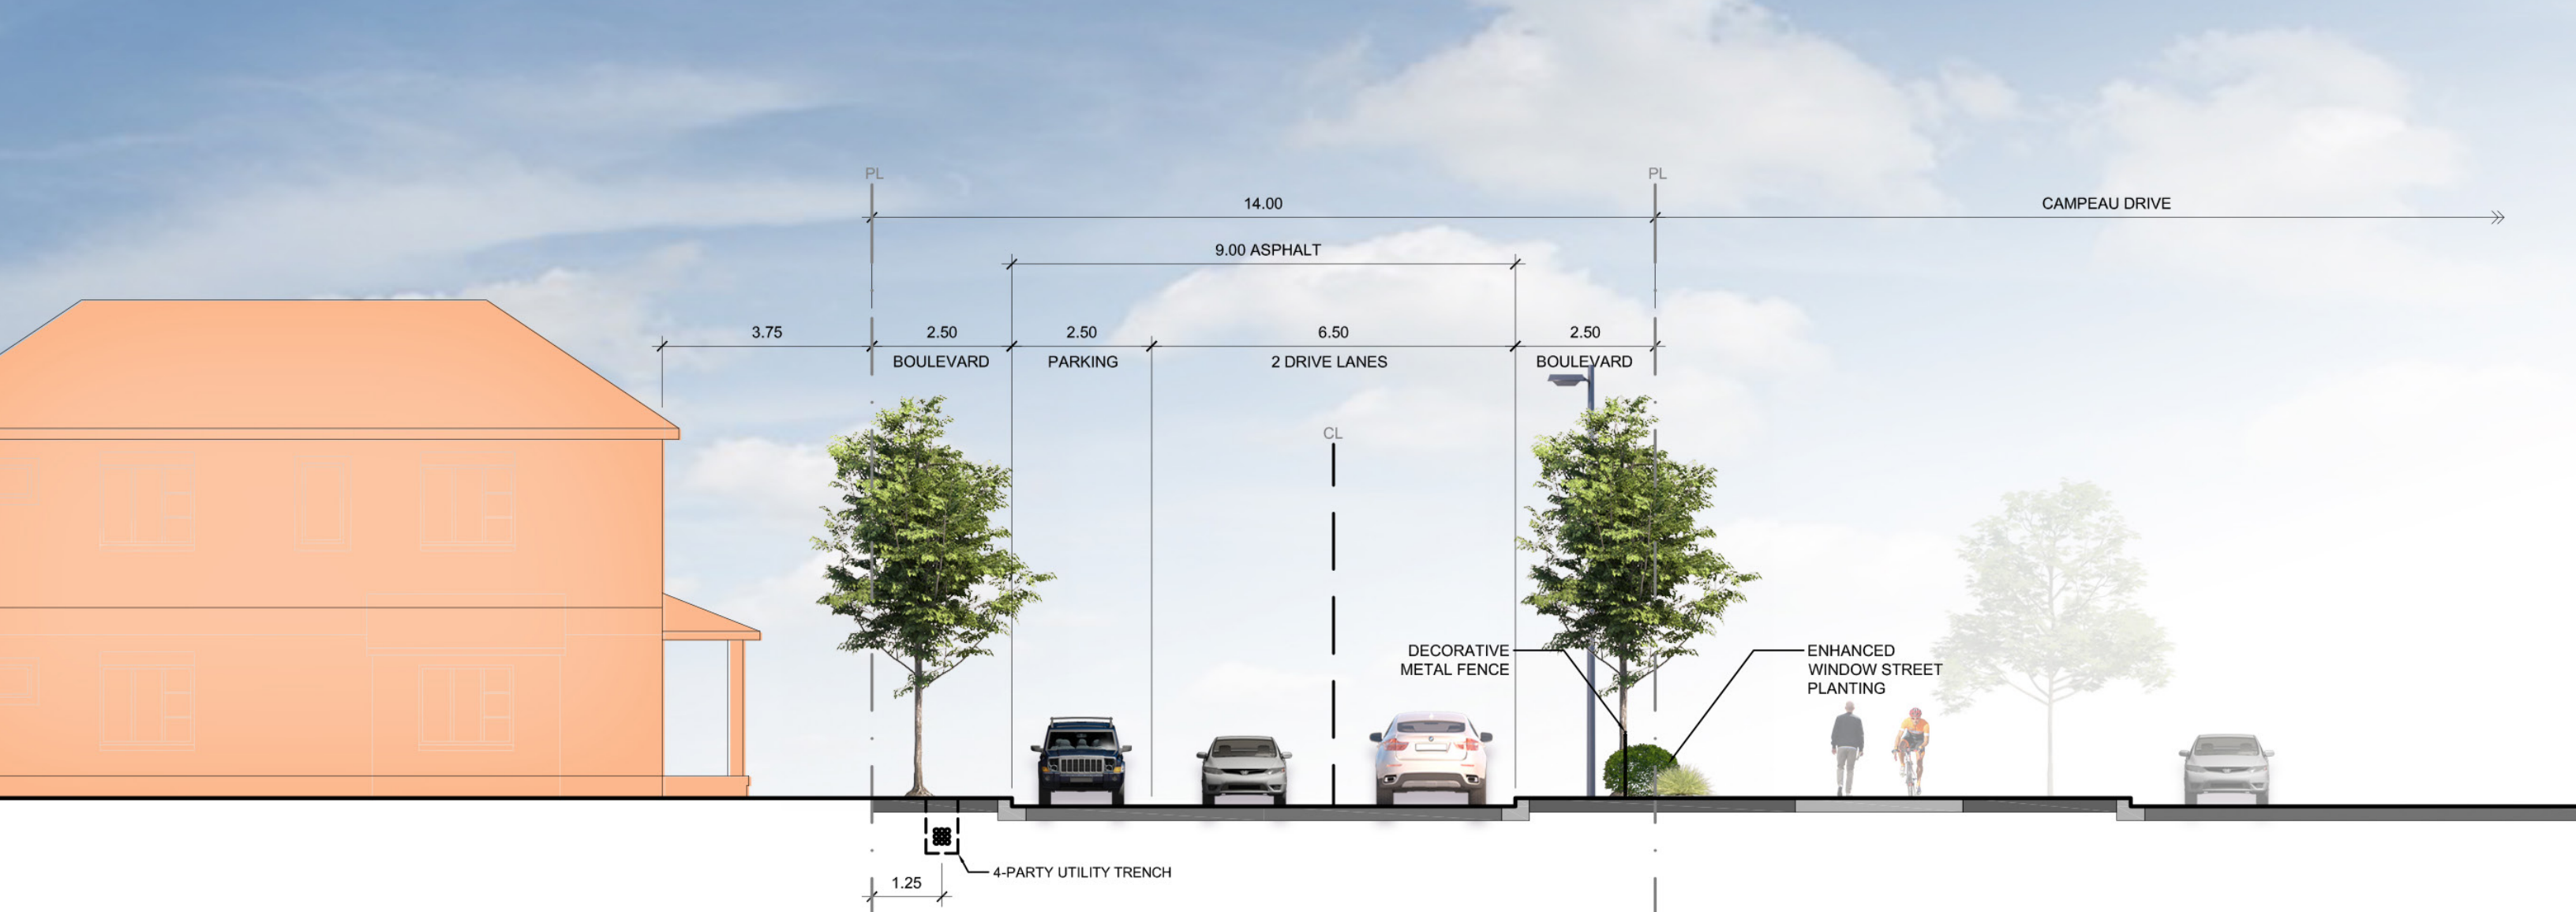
Window Street (14.0m Right-of-Way) Cross Section
